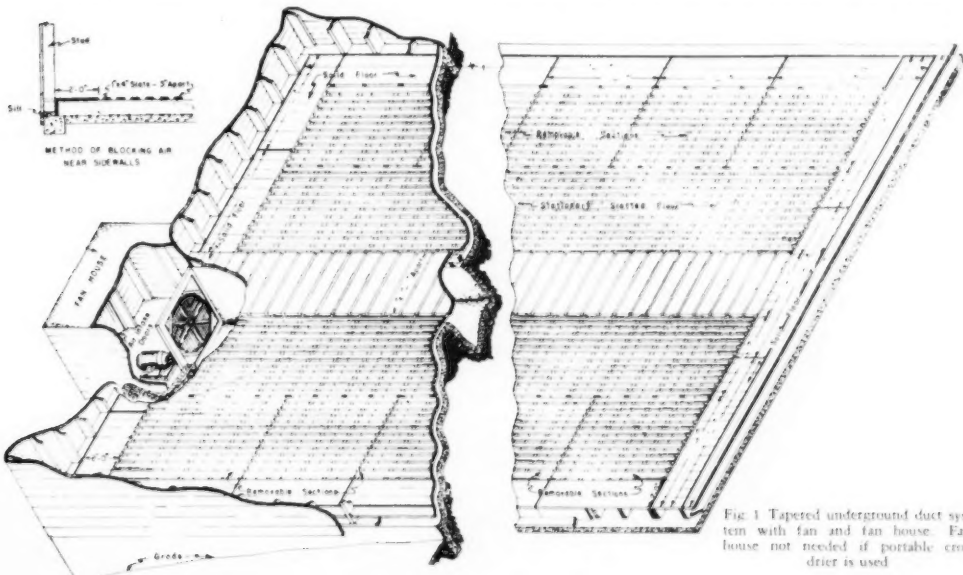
Tapered underground duct system with fan and fan house. Fan house not needed if portable crop drier is used
